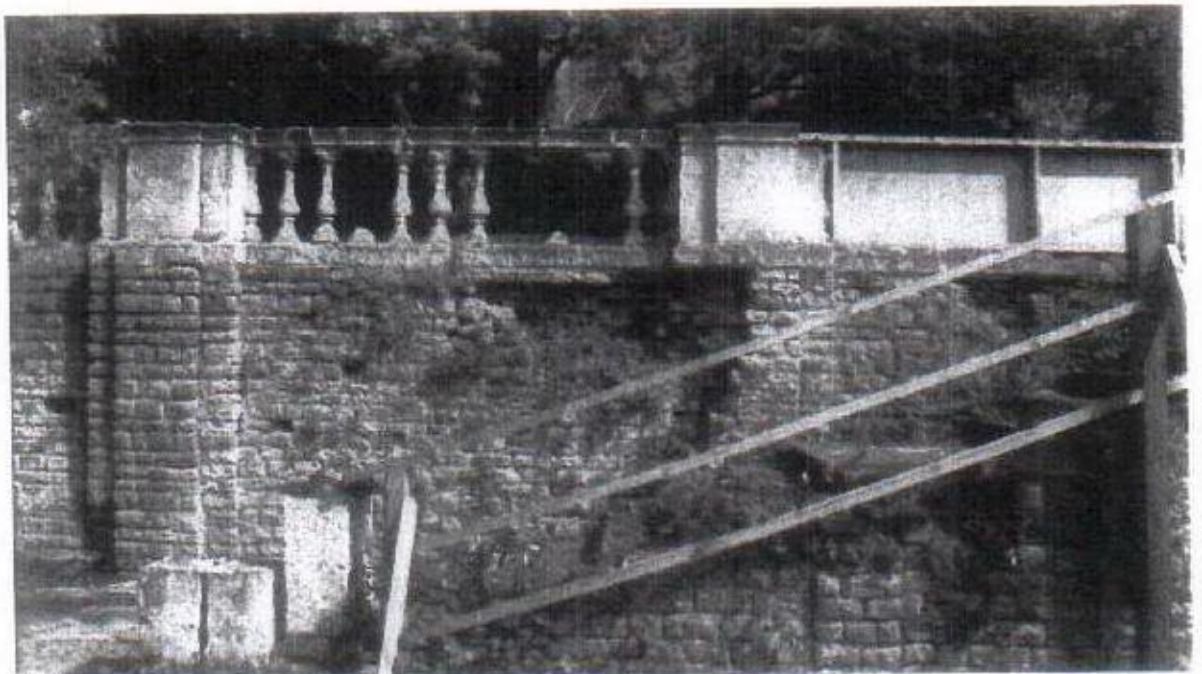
GRAND STAIR, LOWER TERRACE 13
